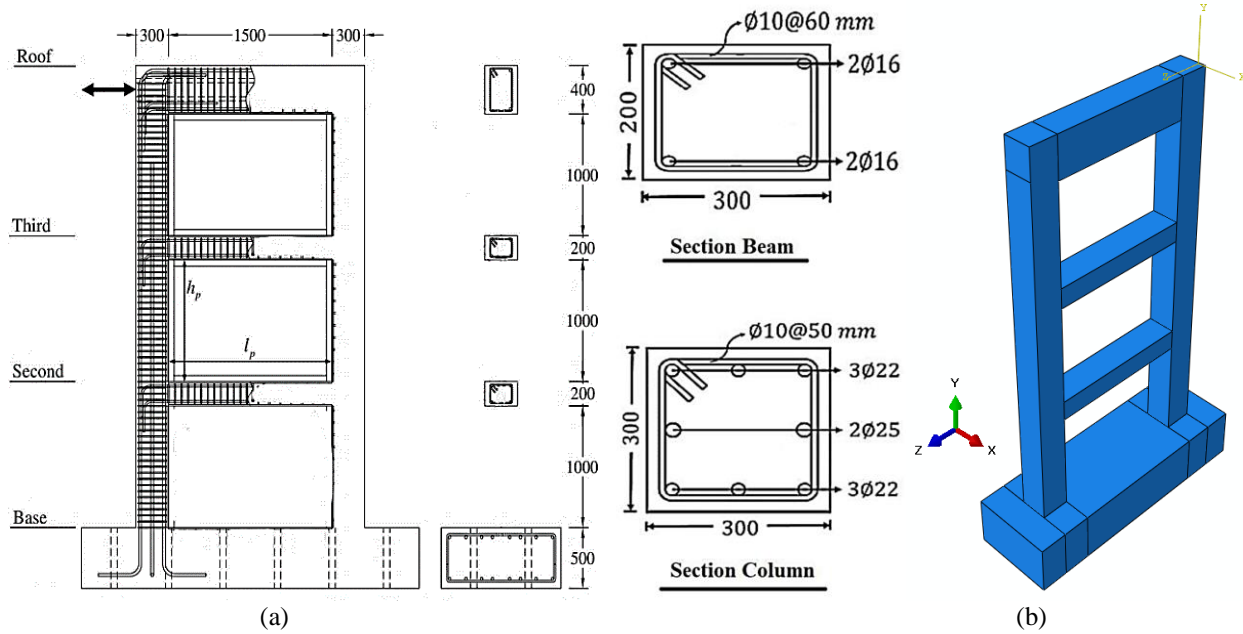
Dimensions and reinforcement details of the RC frame (Choi and Park, 2011): a) Tested specimen (Choi and Park, 2011); b) FE model
